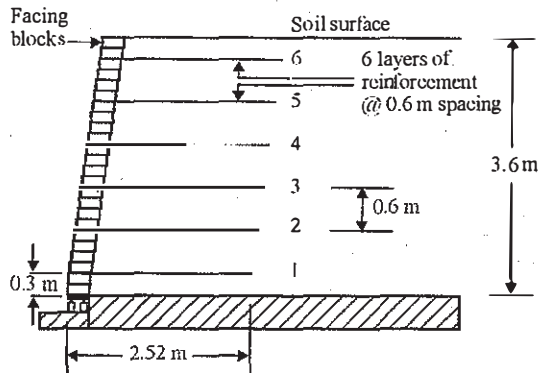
Test configuration for Walls 1, 2, 5 and 6.
